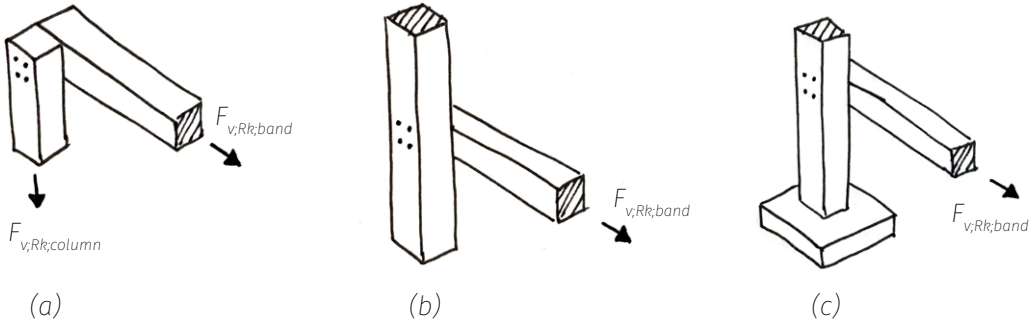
Load transfer of the joints in the timber frame, with (a) column-to-roof band connection; (b) column-to-lintel band connection; (c) column-to-floor band connection.
